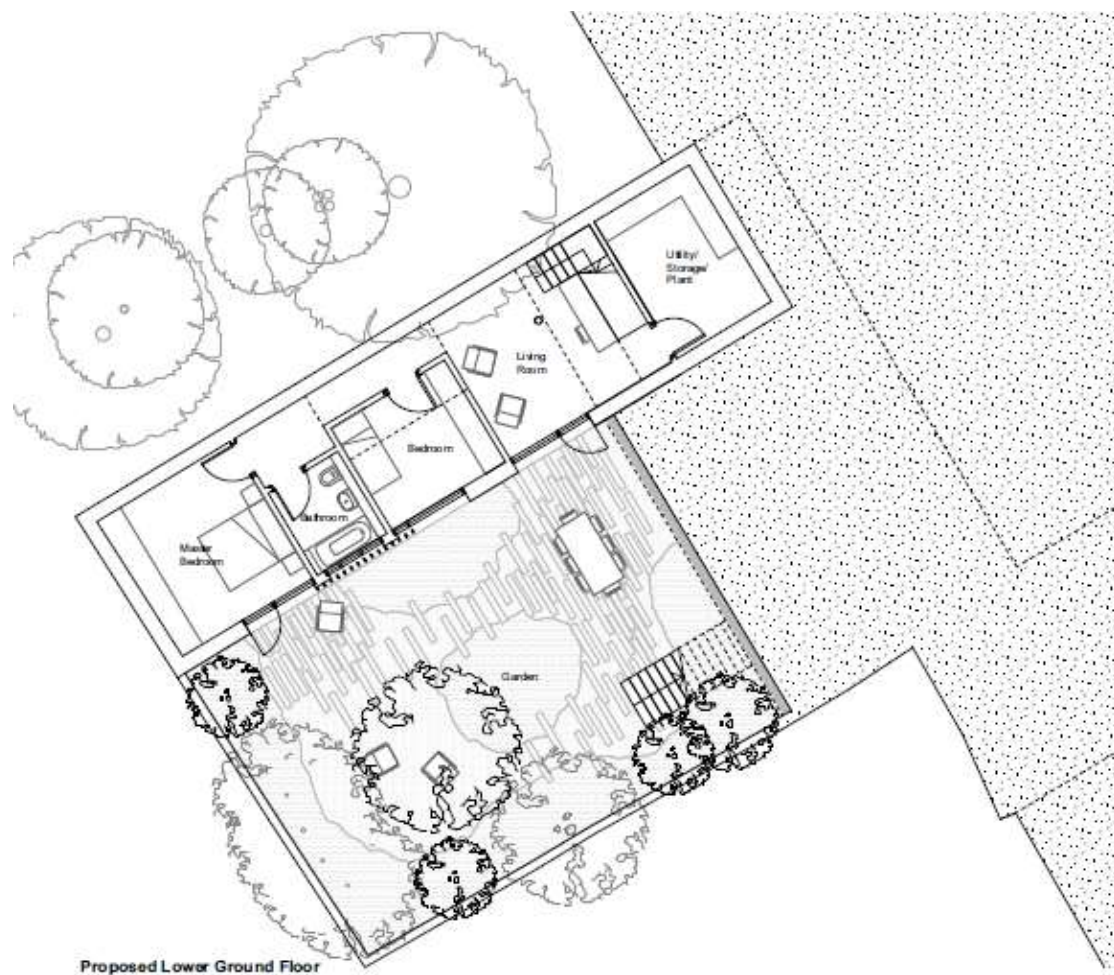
Proposed Ground Floor plan (Studio RO\ST)
